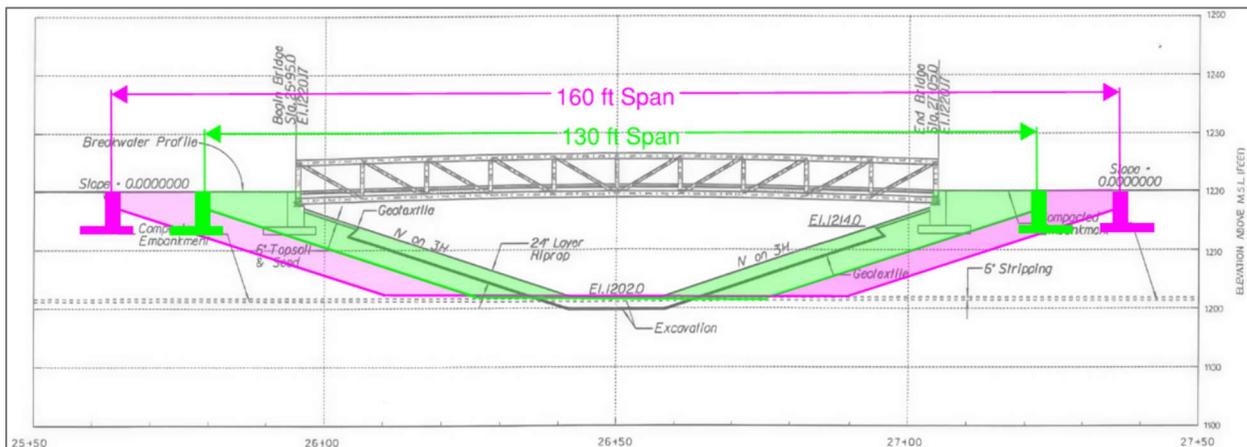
Breakwater as-built plans with channel modifications and bridge span requirements
